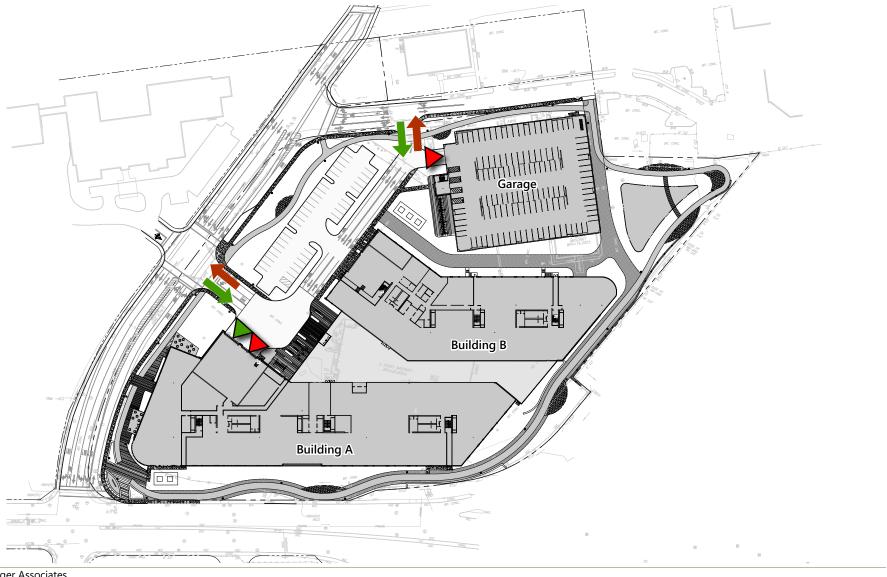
illustrates the site plan and external access points for the Project and includes the garage and loading access points.
